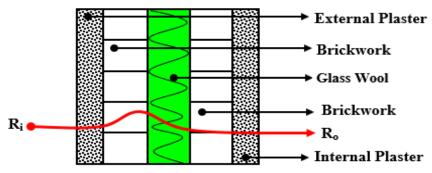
Illustration of the Insulated Sandwich Wall Structure
